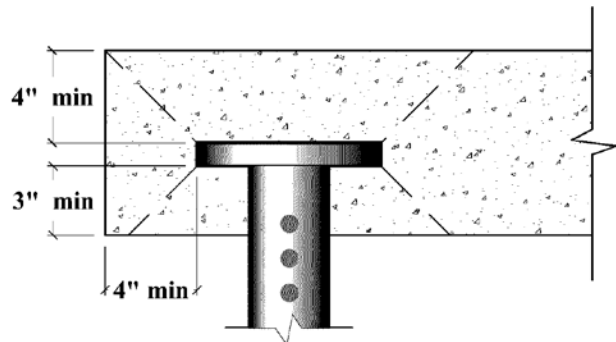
Grade Beam with RDS2875-NCB New Construction Bracket
